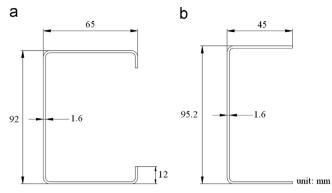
Dimensions of cold-formed steel sections. (a) C-shaped section and (b) track.
